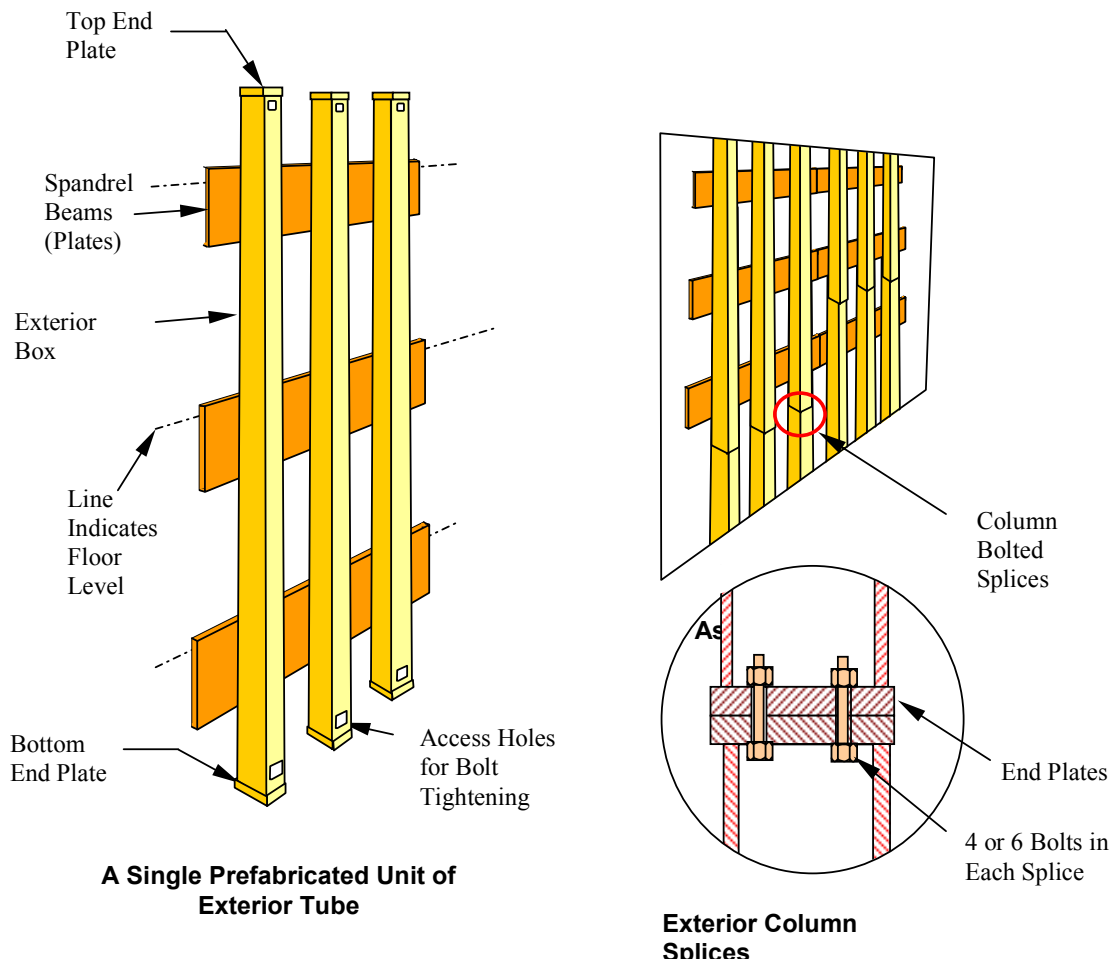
Prefabricated Units of Exterior Tube of the World Trade Center Towers
